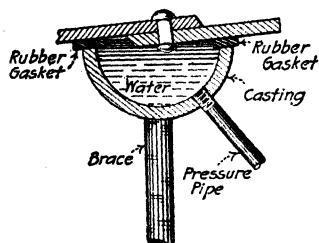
Apparatus for testing separate field joints (steel pipes).
